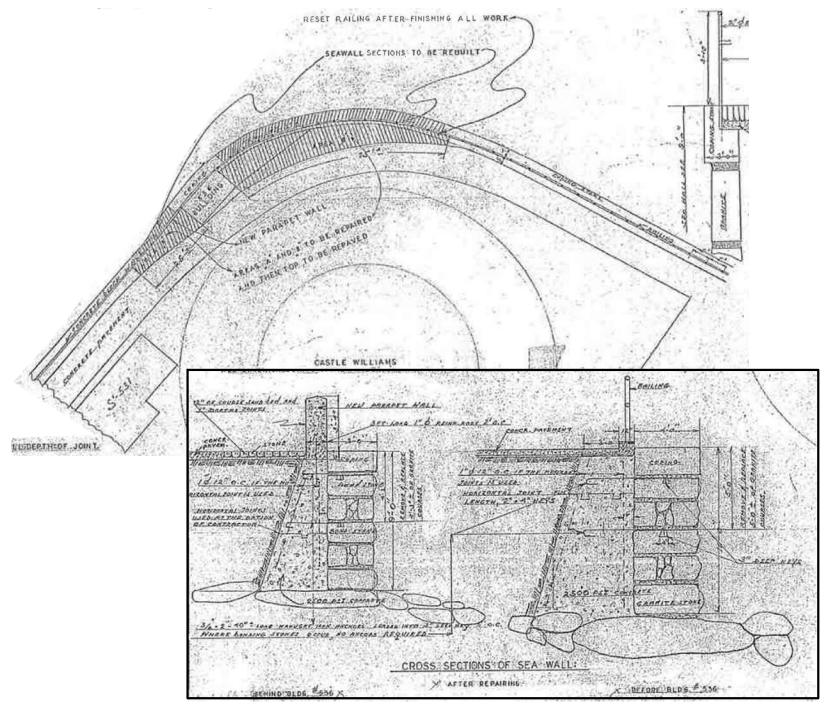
Part of the Post Engineer's drawing Repairing to Seawall, dated 1963, showing the planned addition of a concrete buttress.
